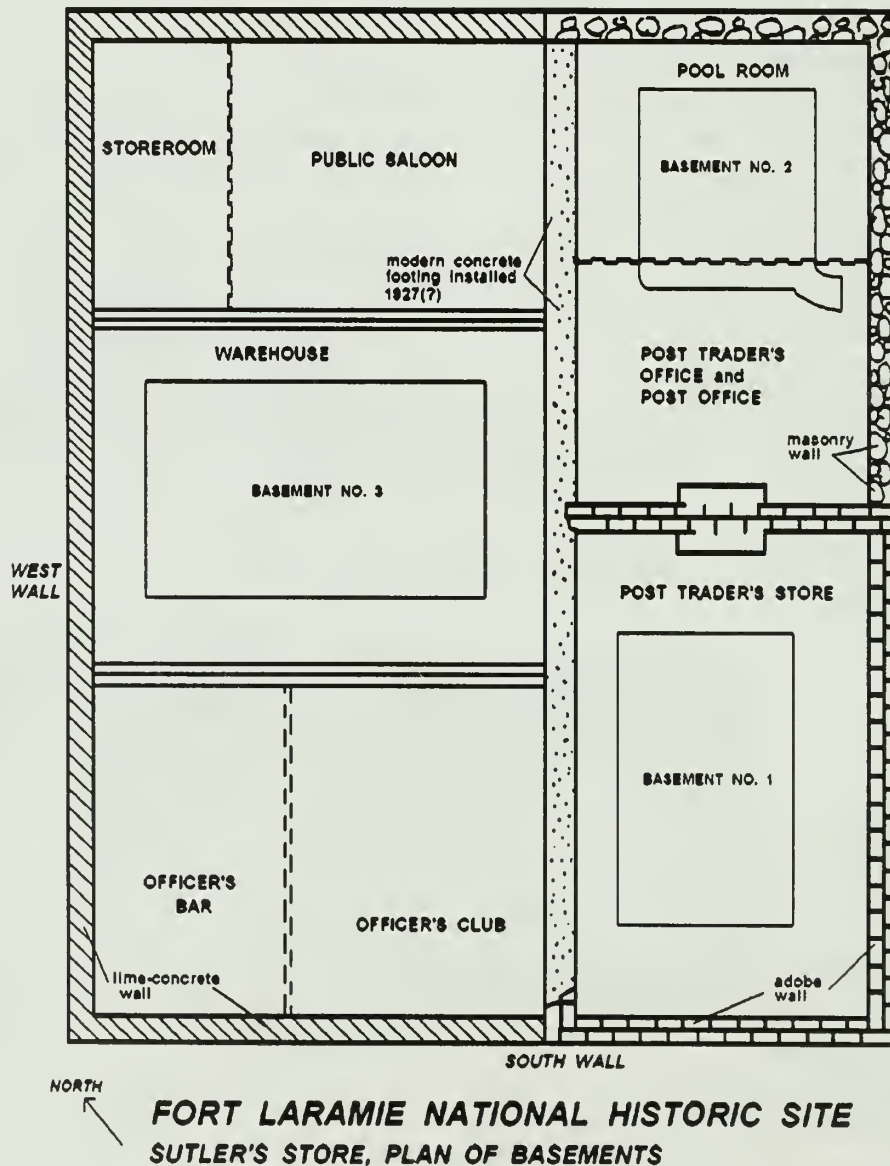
Plan view of basements, Post Sutler's Store (from Beaubien 1951a).
